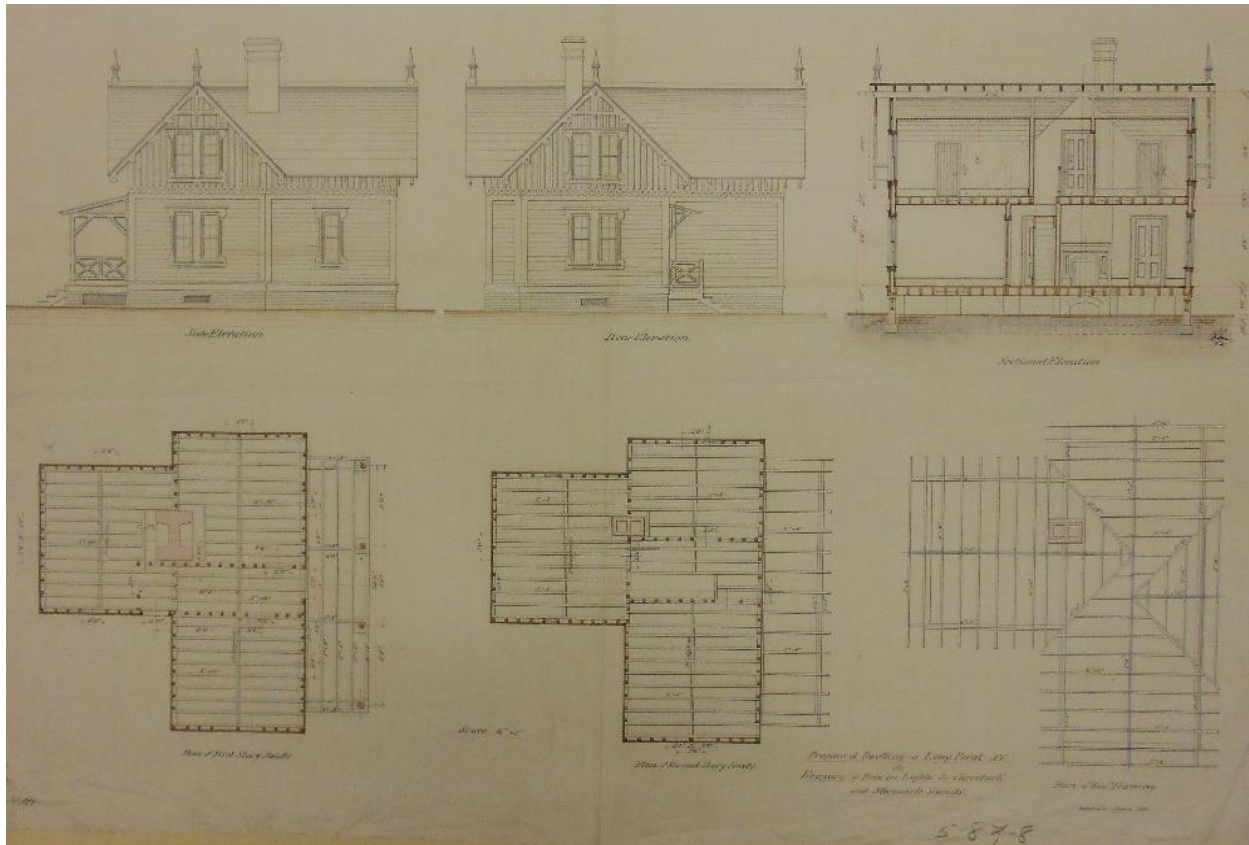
Construction drawing of the small keeper's house originally constructed at Long Point Station (OBHC 1881-1940).
